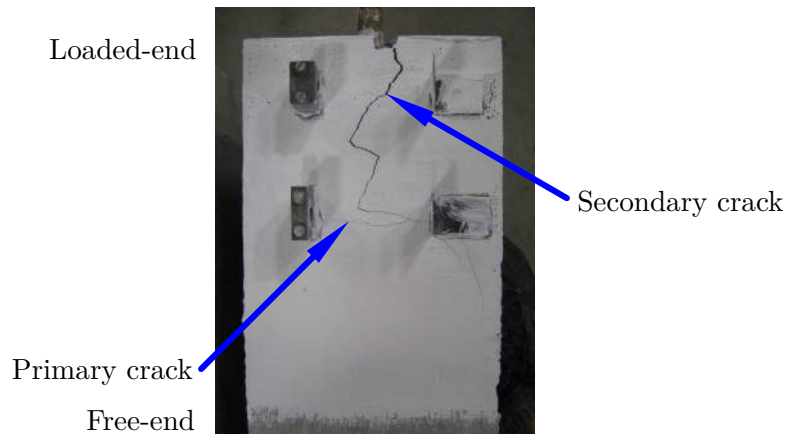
Photograph of the failed 12F-B-20-5 specimen with secondary cracks visible. Primary cracks can also be seen at the free-end side of the embedded length, suggesting good debonding measures and structural loading.
